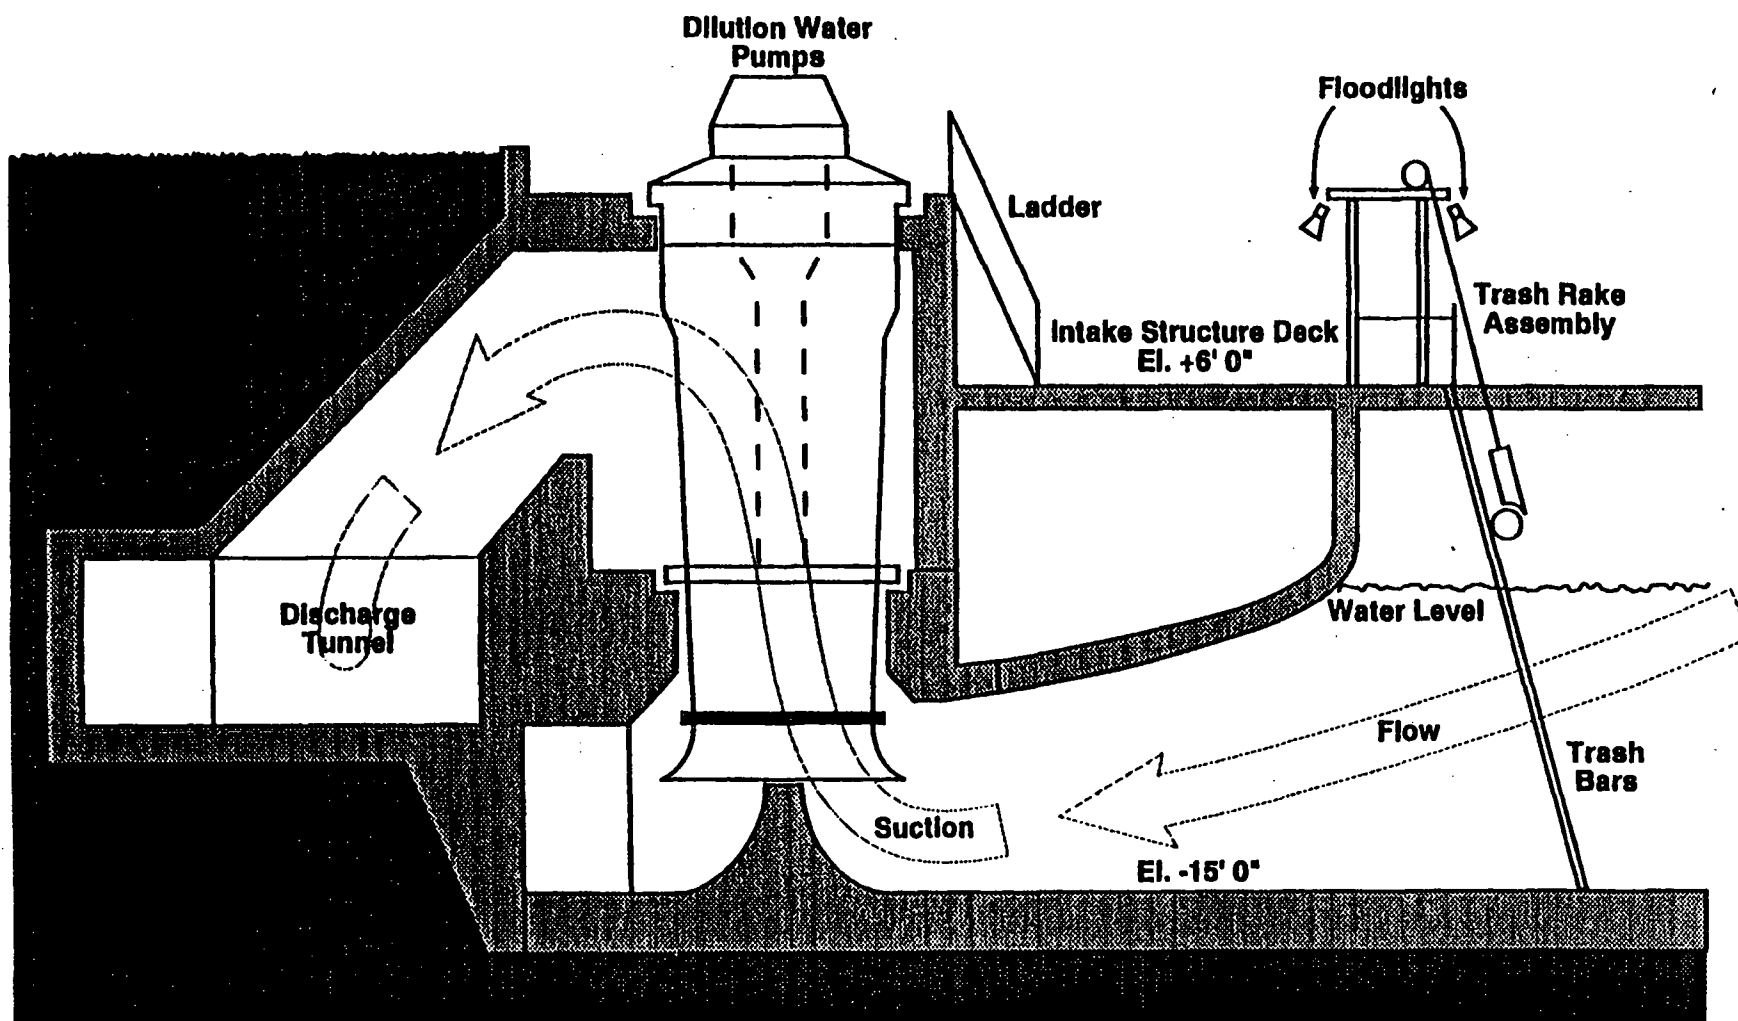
OCNGS Dilution Water System Intake Structure, Section View.
